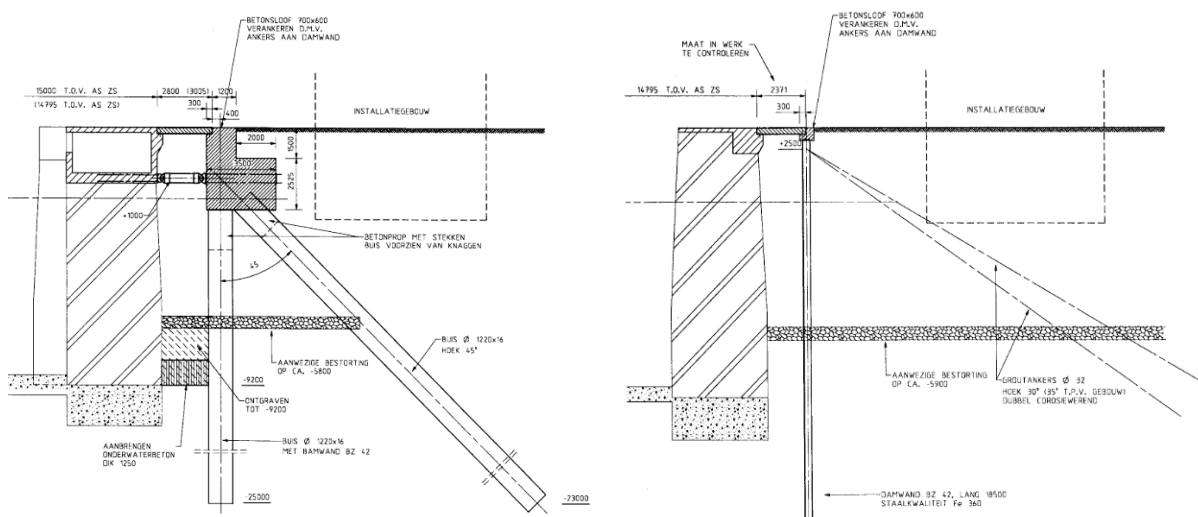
LEFT: Enhancement of lock head construction at the Southern lock in IJmuiden. RIGHT: Enhancement of chamber wall. Retrieved from Beem et al. (2000).
